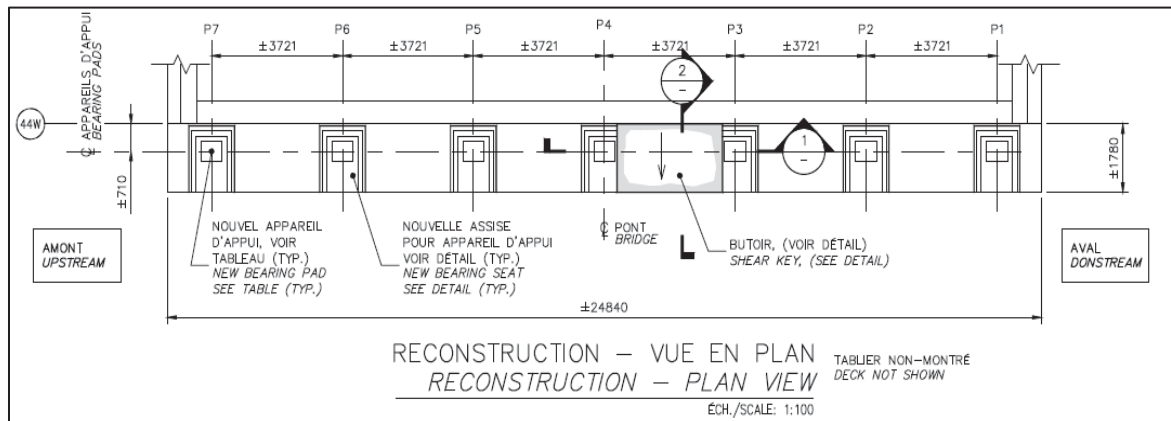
Plan view of abutment 44 west of original CHB provided by JCCBI
